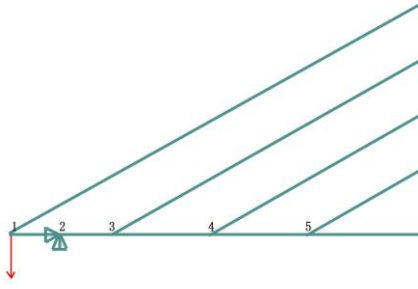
Substructure containing No.1 beam element and No.128 cable element
